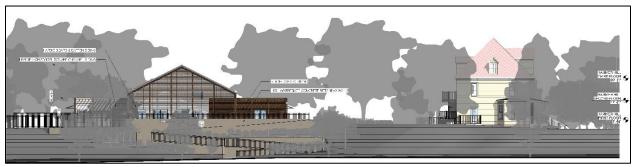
South Elevation from Stringtown Road of Daycare Center and Historical Structure
